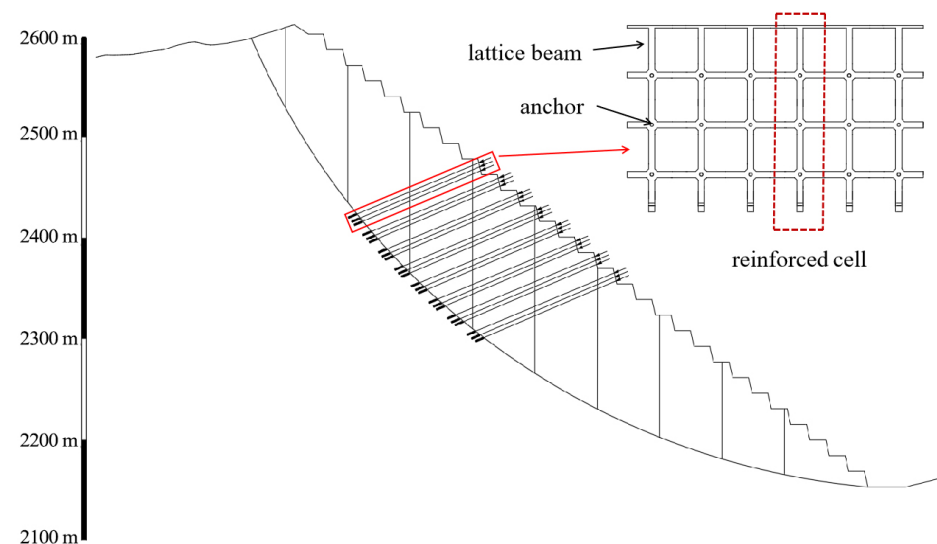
Schematic diagram of anchor lattice beam reinforcement structure.
